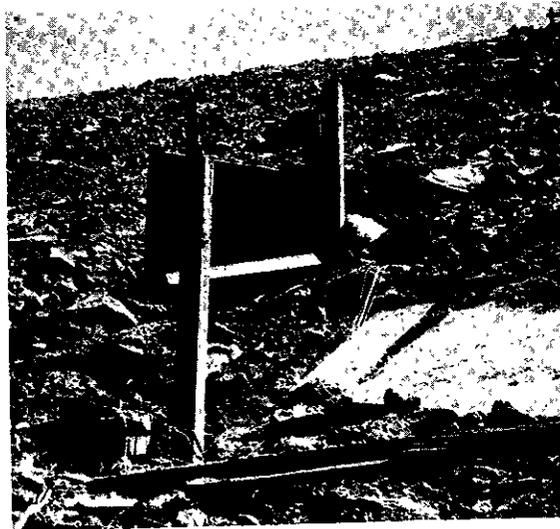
A typical example of the severe damage often inflicted on installations from large rocks rolling down the fill slope during construction. Compare with Figures 22 and 23. Note the almost complete destruction of the "protective" wingwall.
